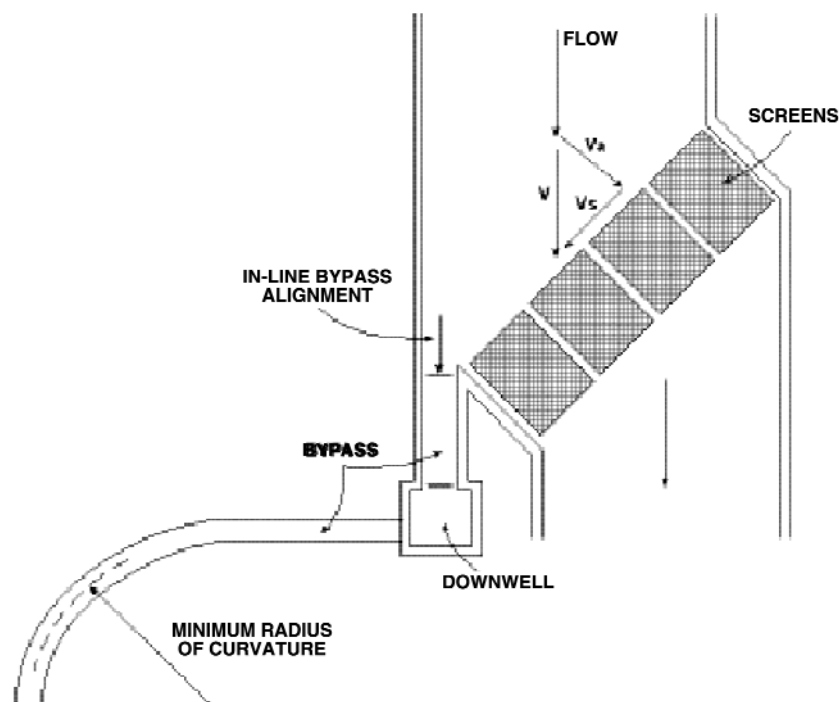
Plan View of Fish Bypass System at Drum Screen Installation (WDFW, 2000)
